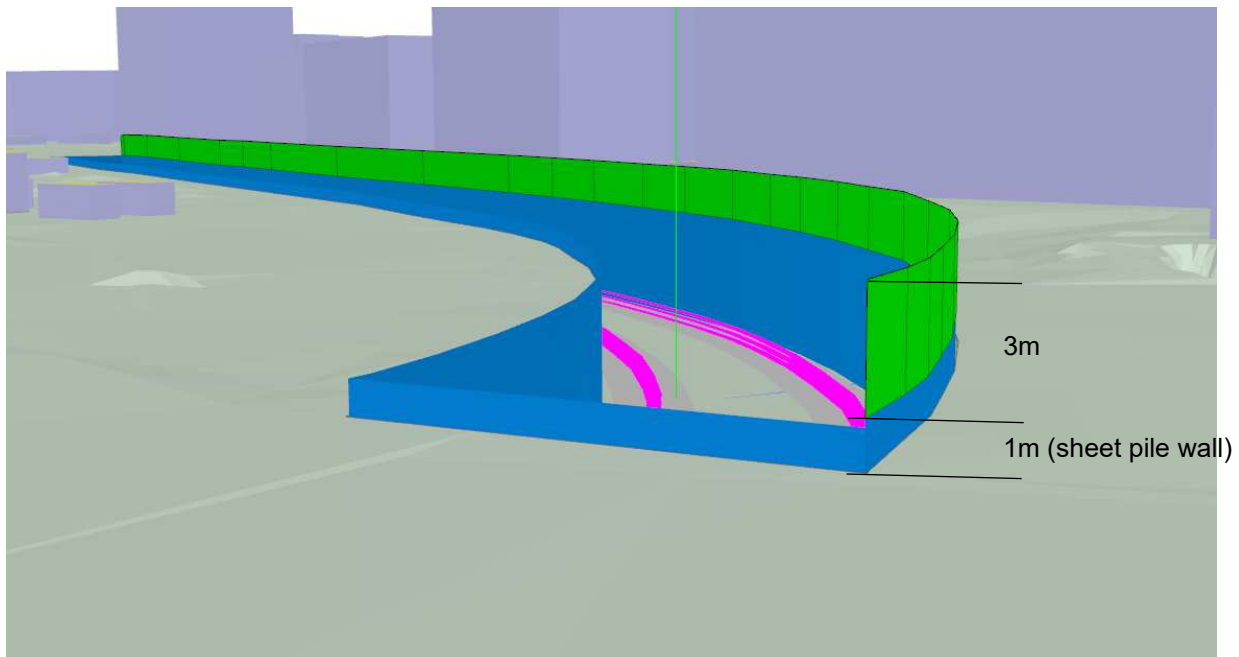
Scenario 3. Sketch of a new 3 m high barrier (green shading) installed on top of the edge of the existing sheet-pile wall (blue shading).
